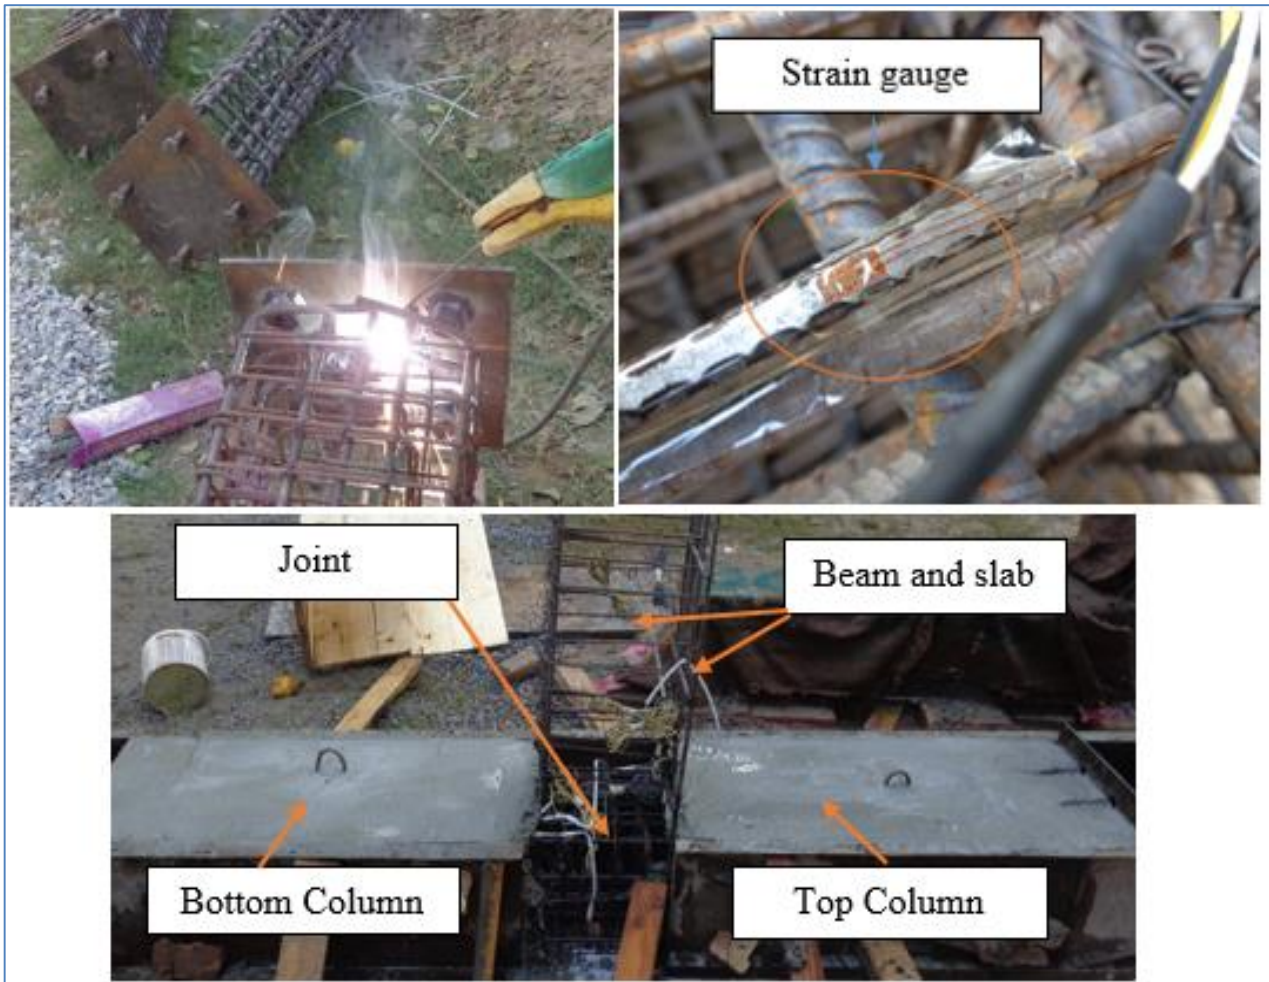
Steel plate welding, strain gauge installations, and sequential pouring
